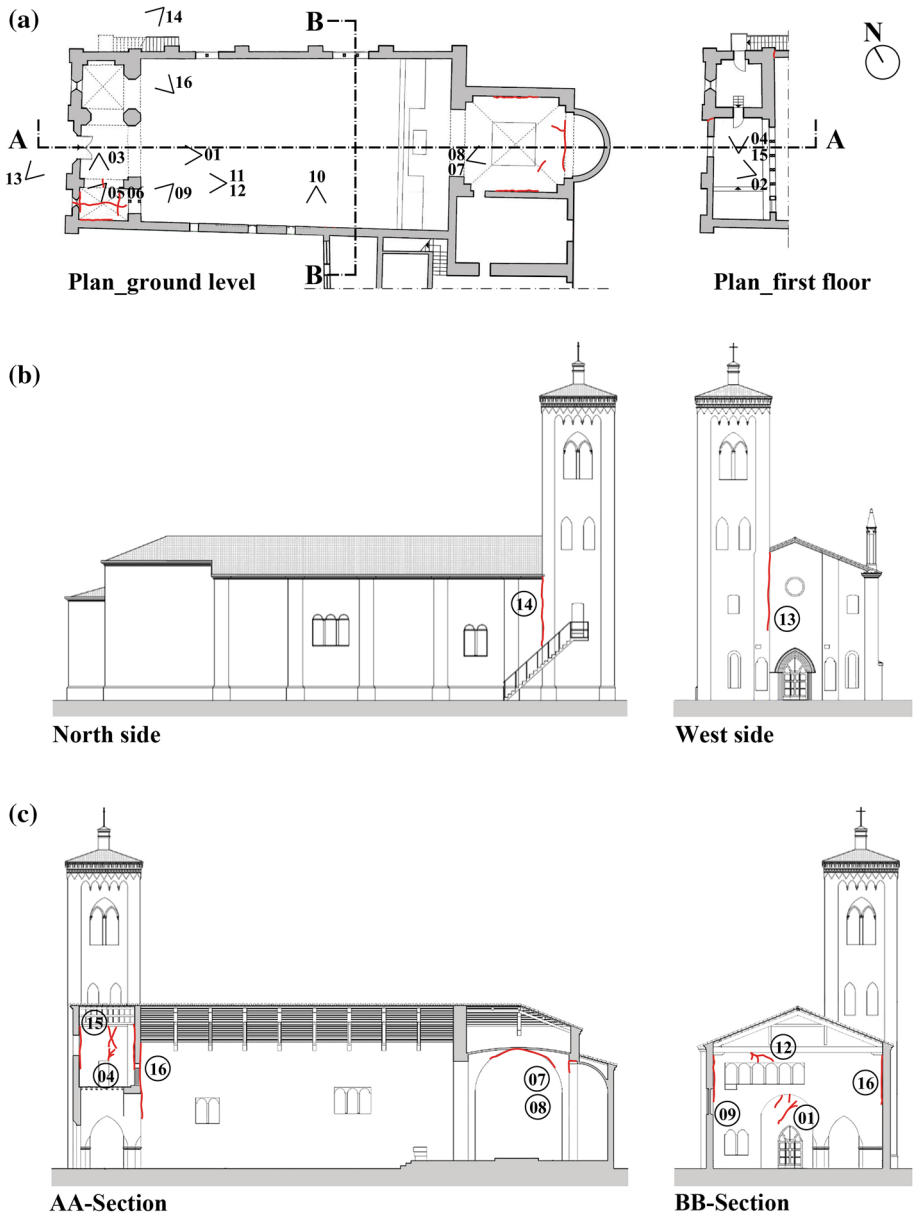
Santa Maria Assunta church damage survey: crack pattern
